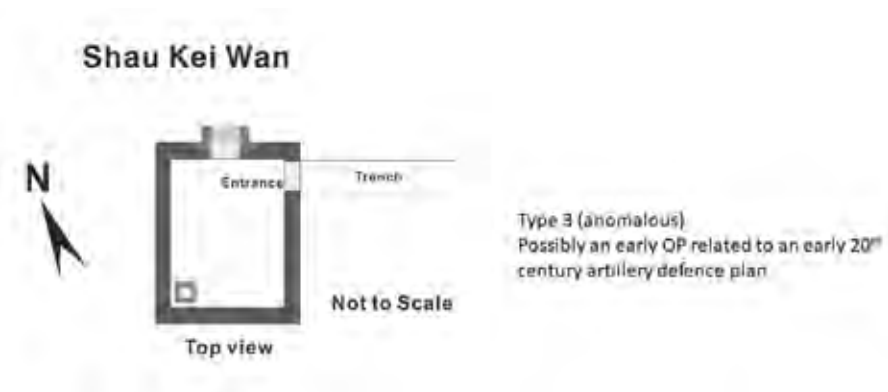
The footprint and interior plan of OP Shaukeiwan (Shau Ki Wan) (not to scale)
